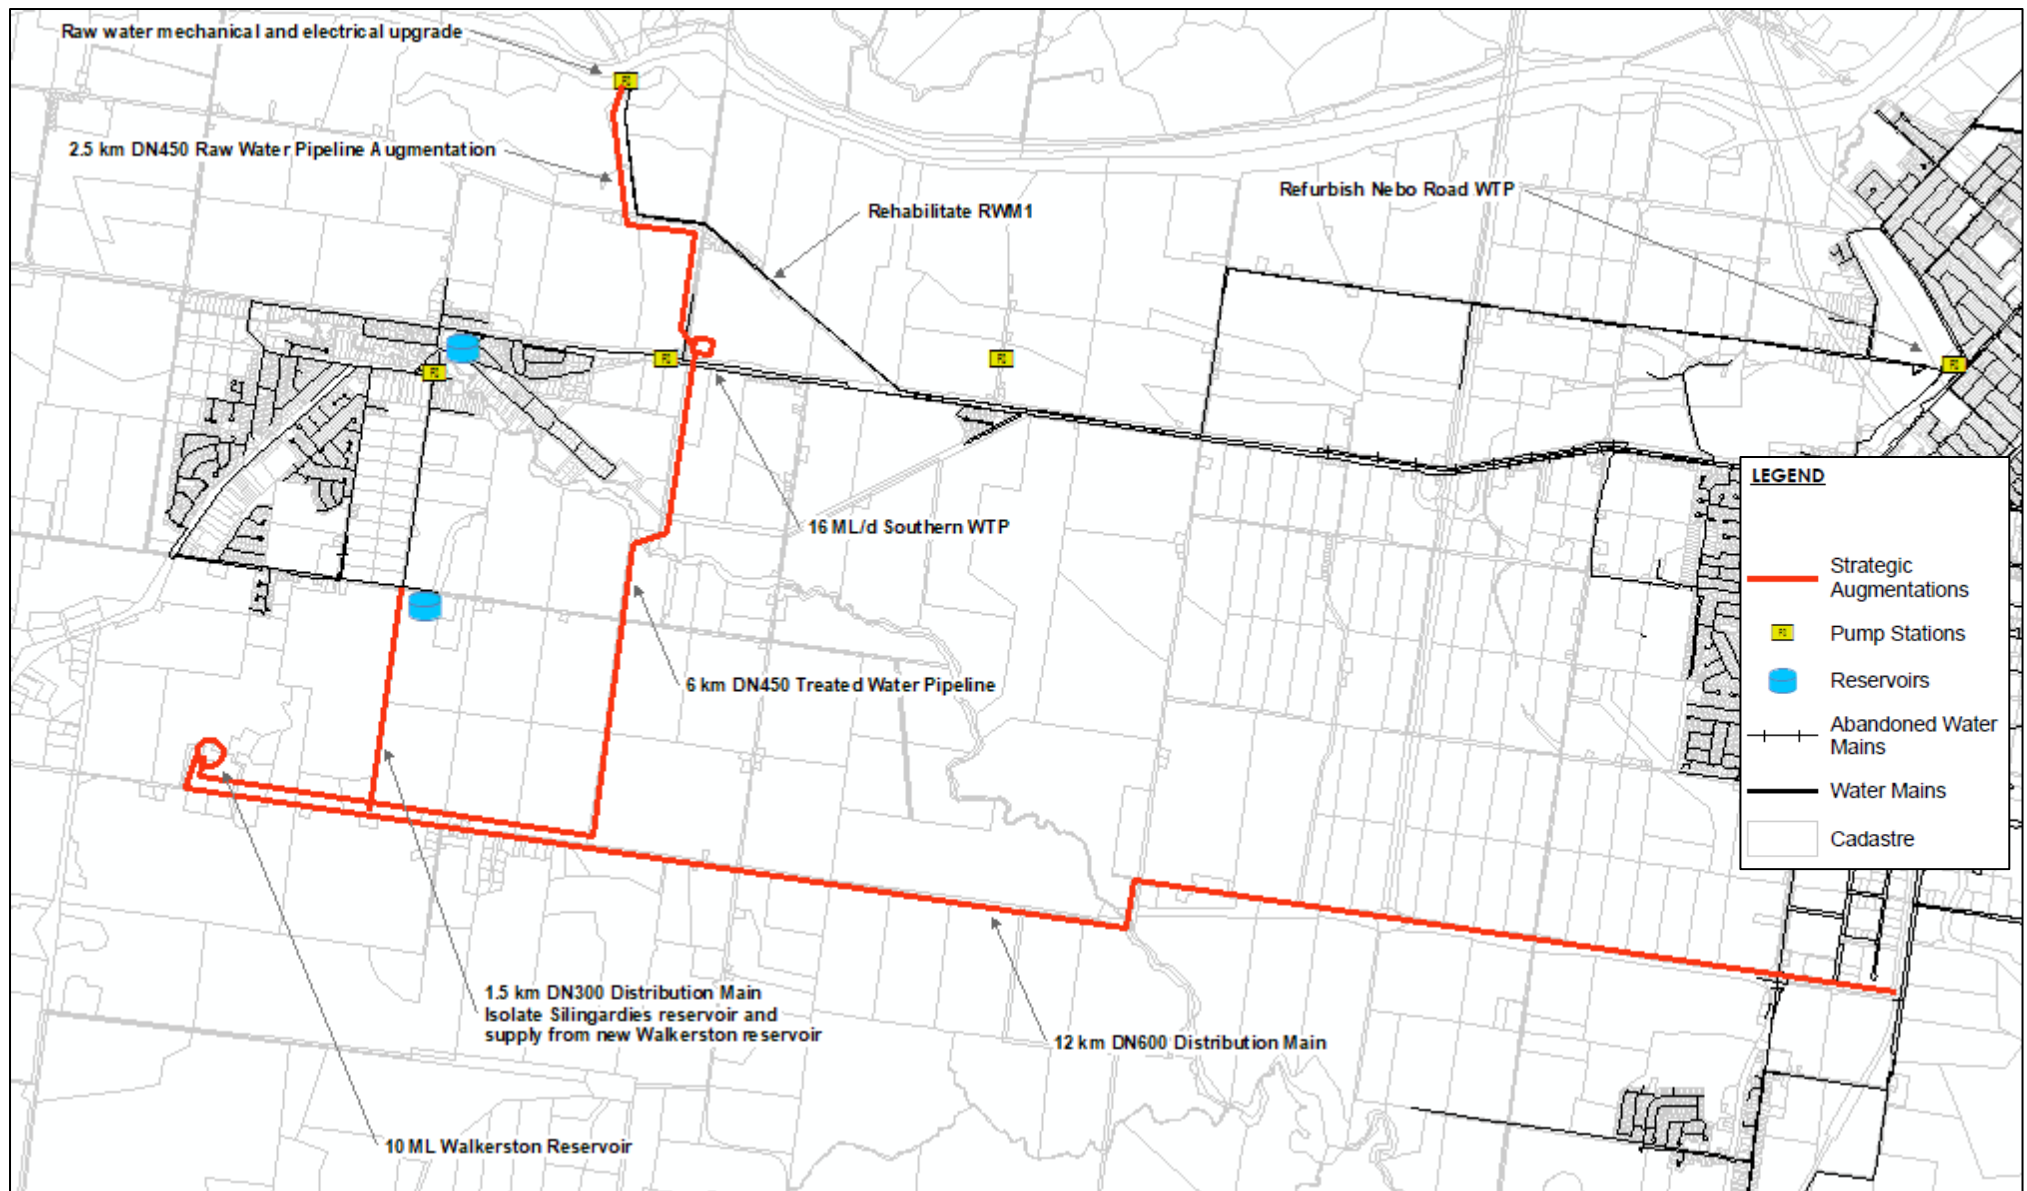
Option 1 – Build Southern WTP to Augment Nebo Road WTP
